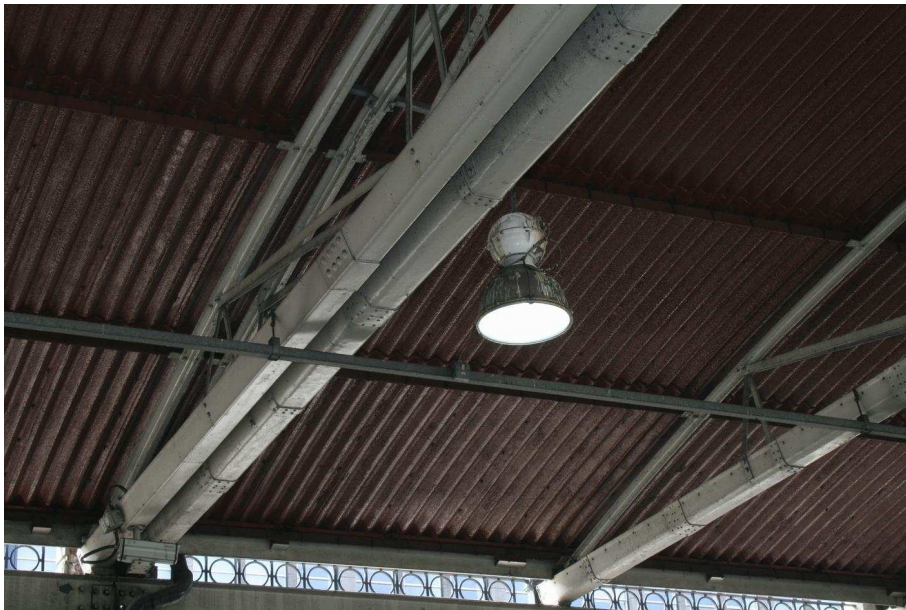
Detail of truss with possible repaired strut running into the interior of the trough
